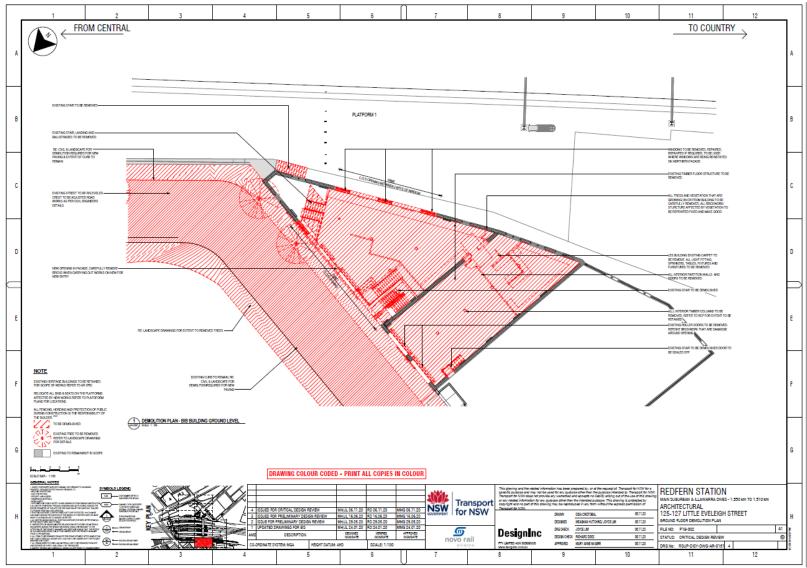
Ground Floor Demolition Plan– Little Eveleigh Street.
